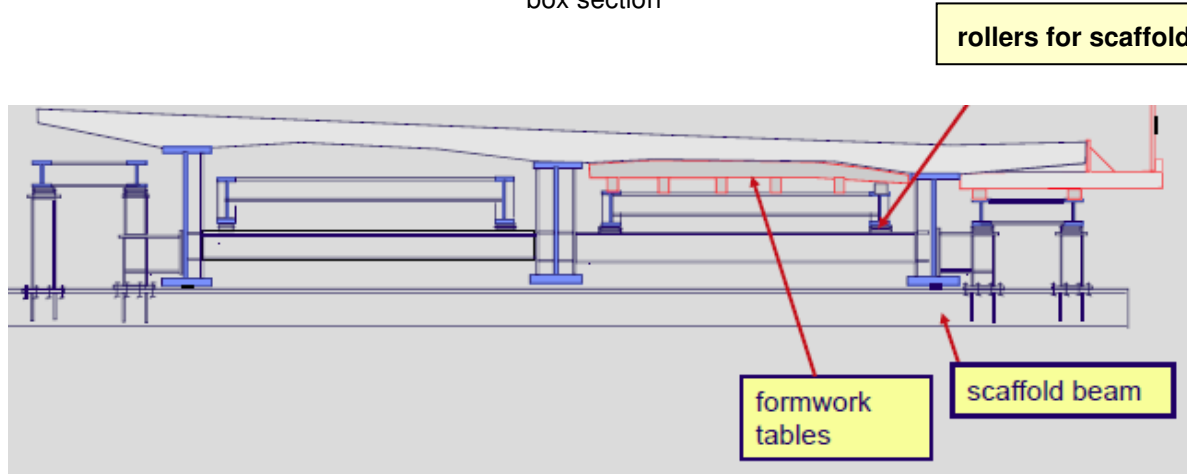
Scaffold erection under the composite structure, by means of formwork carriage – cross section and beams
